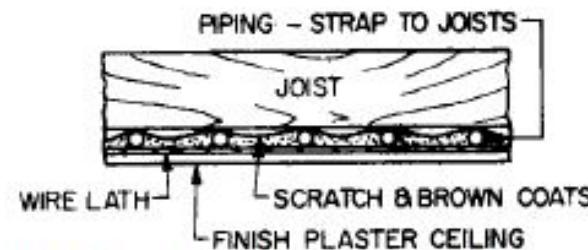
Pipe coil embedded above lath and plaster ceiling for radiant heating.
